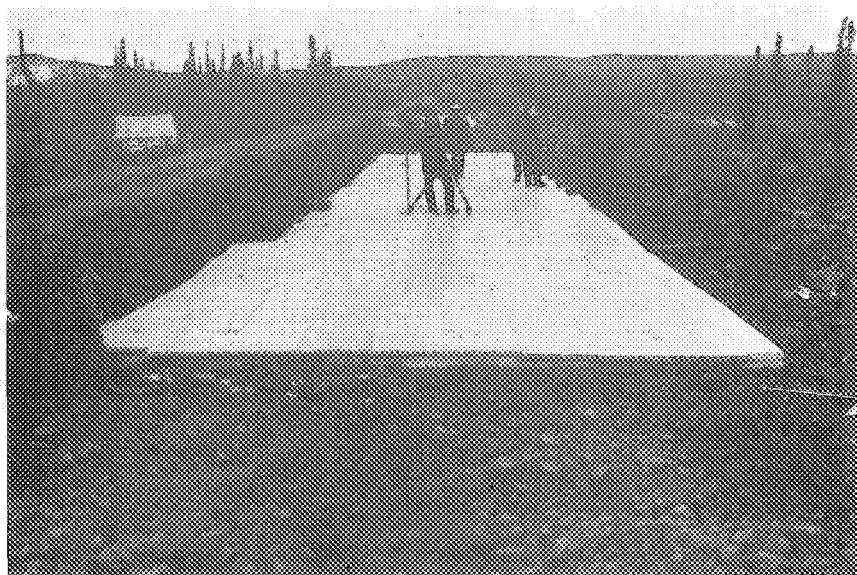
Summer test site--North half. Insulation laid--4.5" section in foreground, control and 3.5" sections in background.
